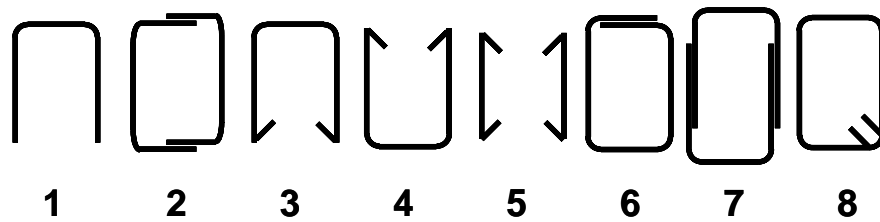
Anderson and Ramirez narrow beam stirrup detailing schemes
